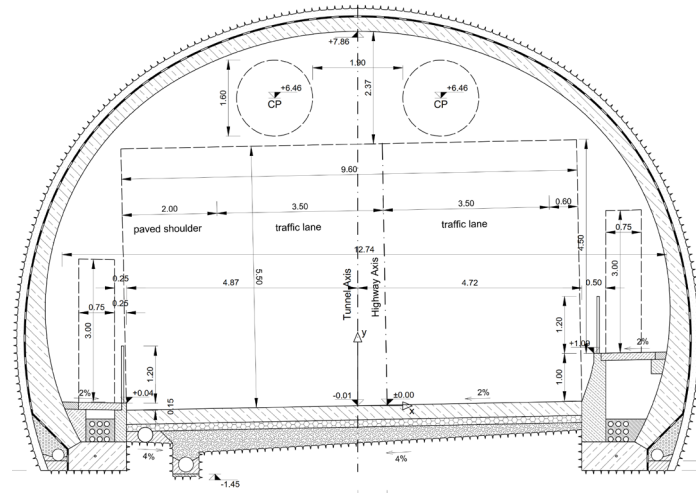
Typical tunnel cross section, largest road tunnel in Indian Himalaya
